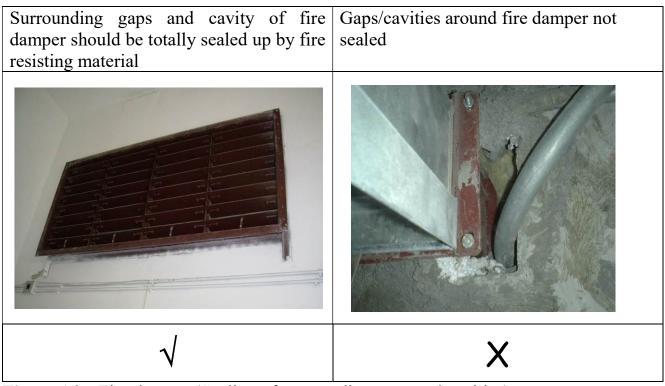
Fire damper (Sealing of surrounding gaps and cavities)
